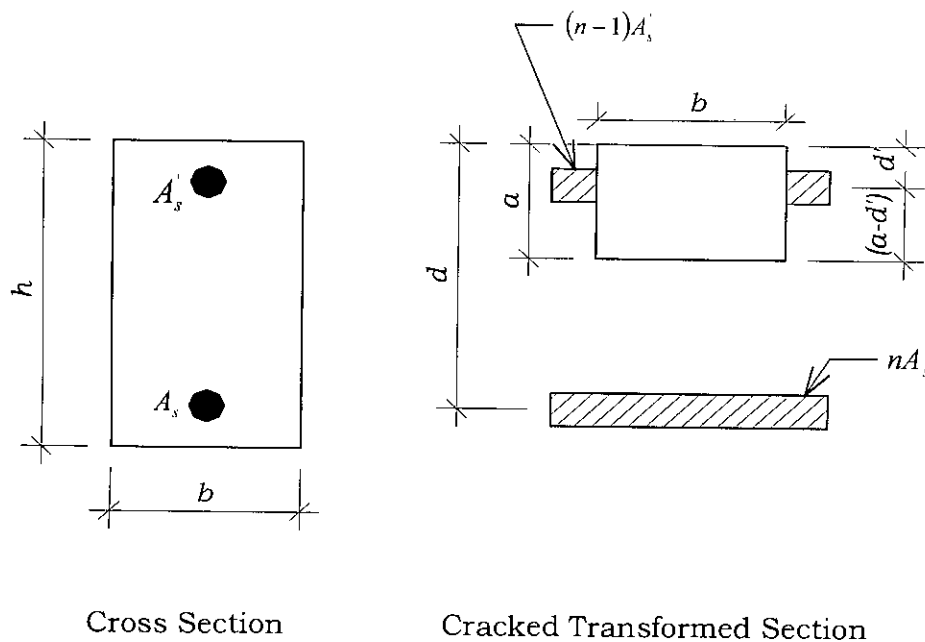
Actual cross-section and cracked transformed section of beam
